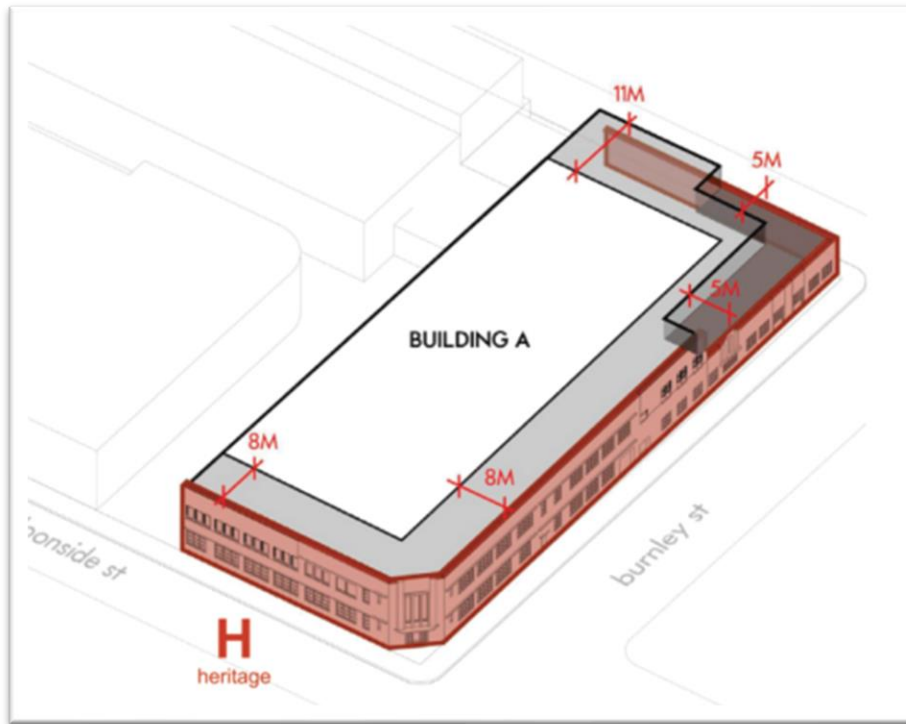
Proposed setbacks of Building A. Source: Development Plan (Gurner 2023)
